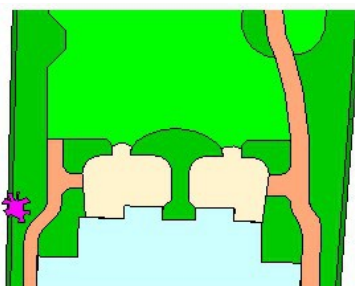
above shows the newly proposed garden plan with the Larch tree (T9) retained.
